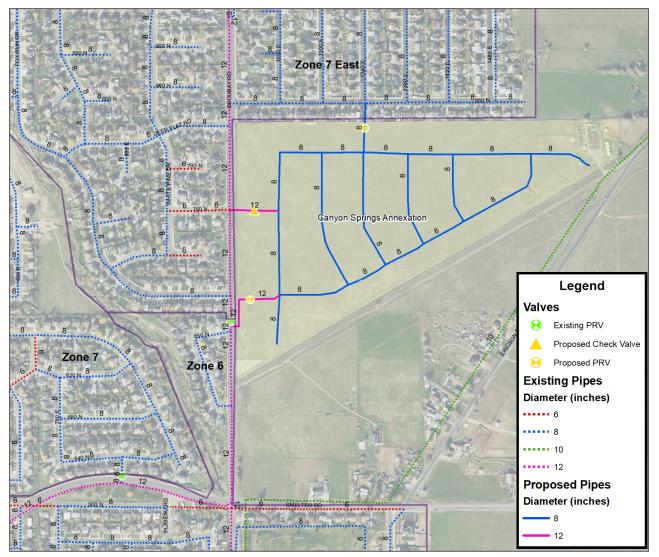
DEVELOPMENT LOCATION AND DRINKING WATER SYSTEM PIPE SIZE
